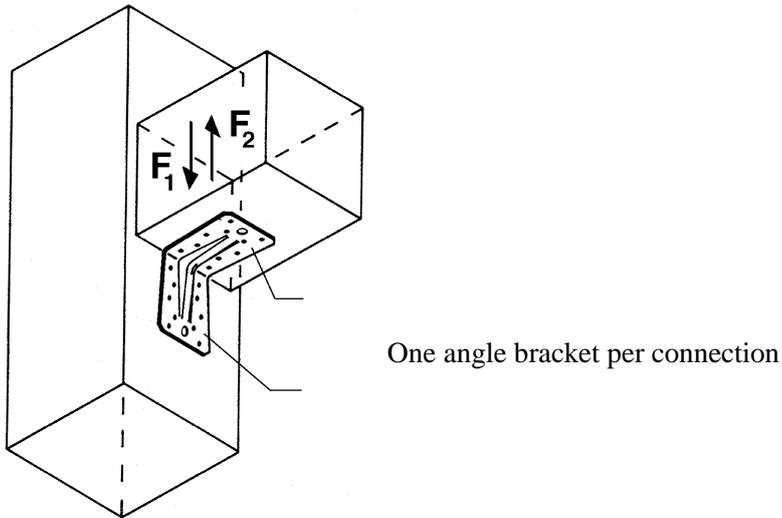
Beam to column connection – Angle bracket with a rib
